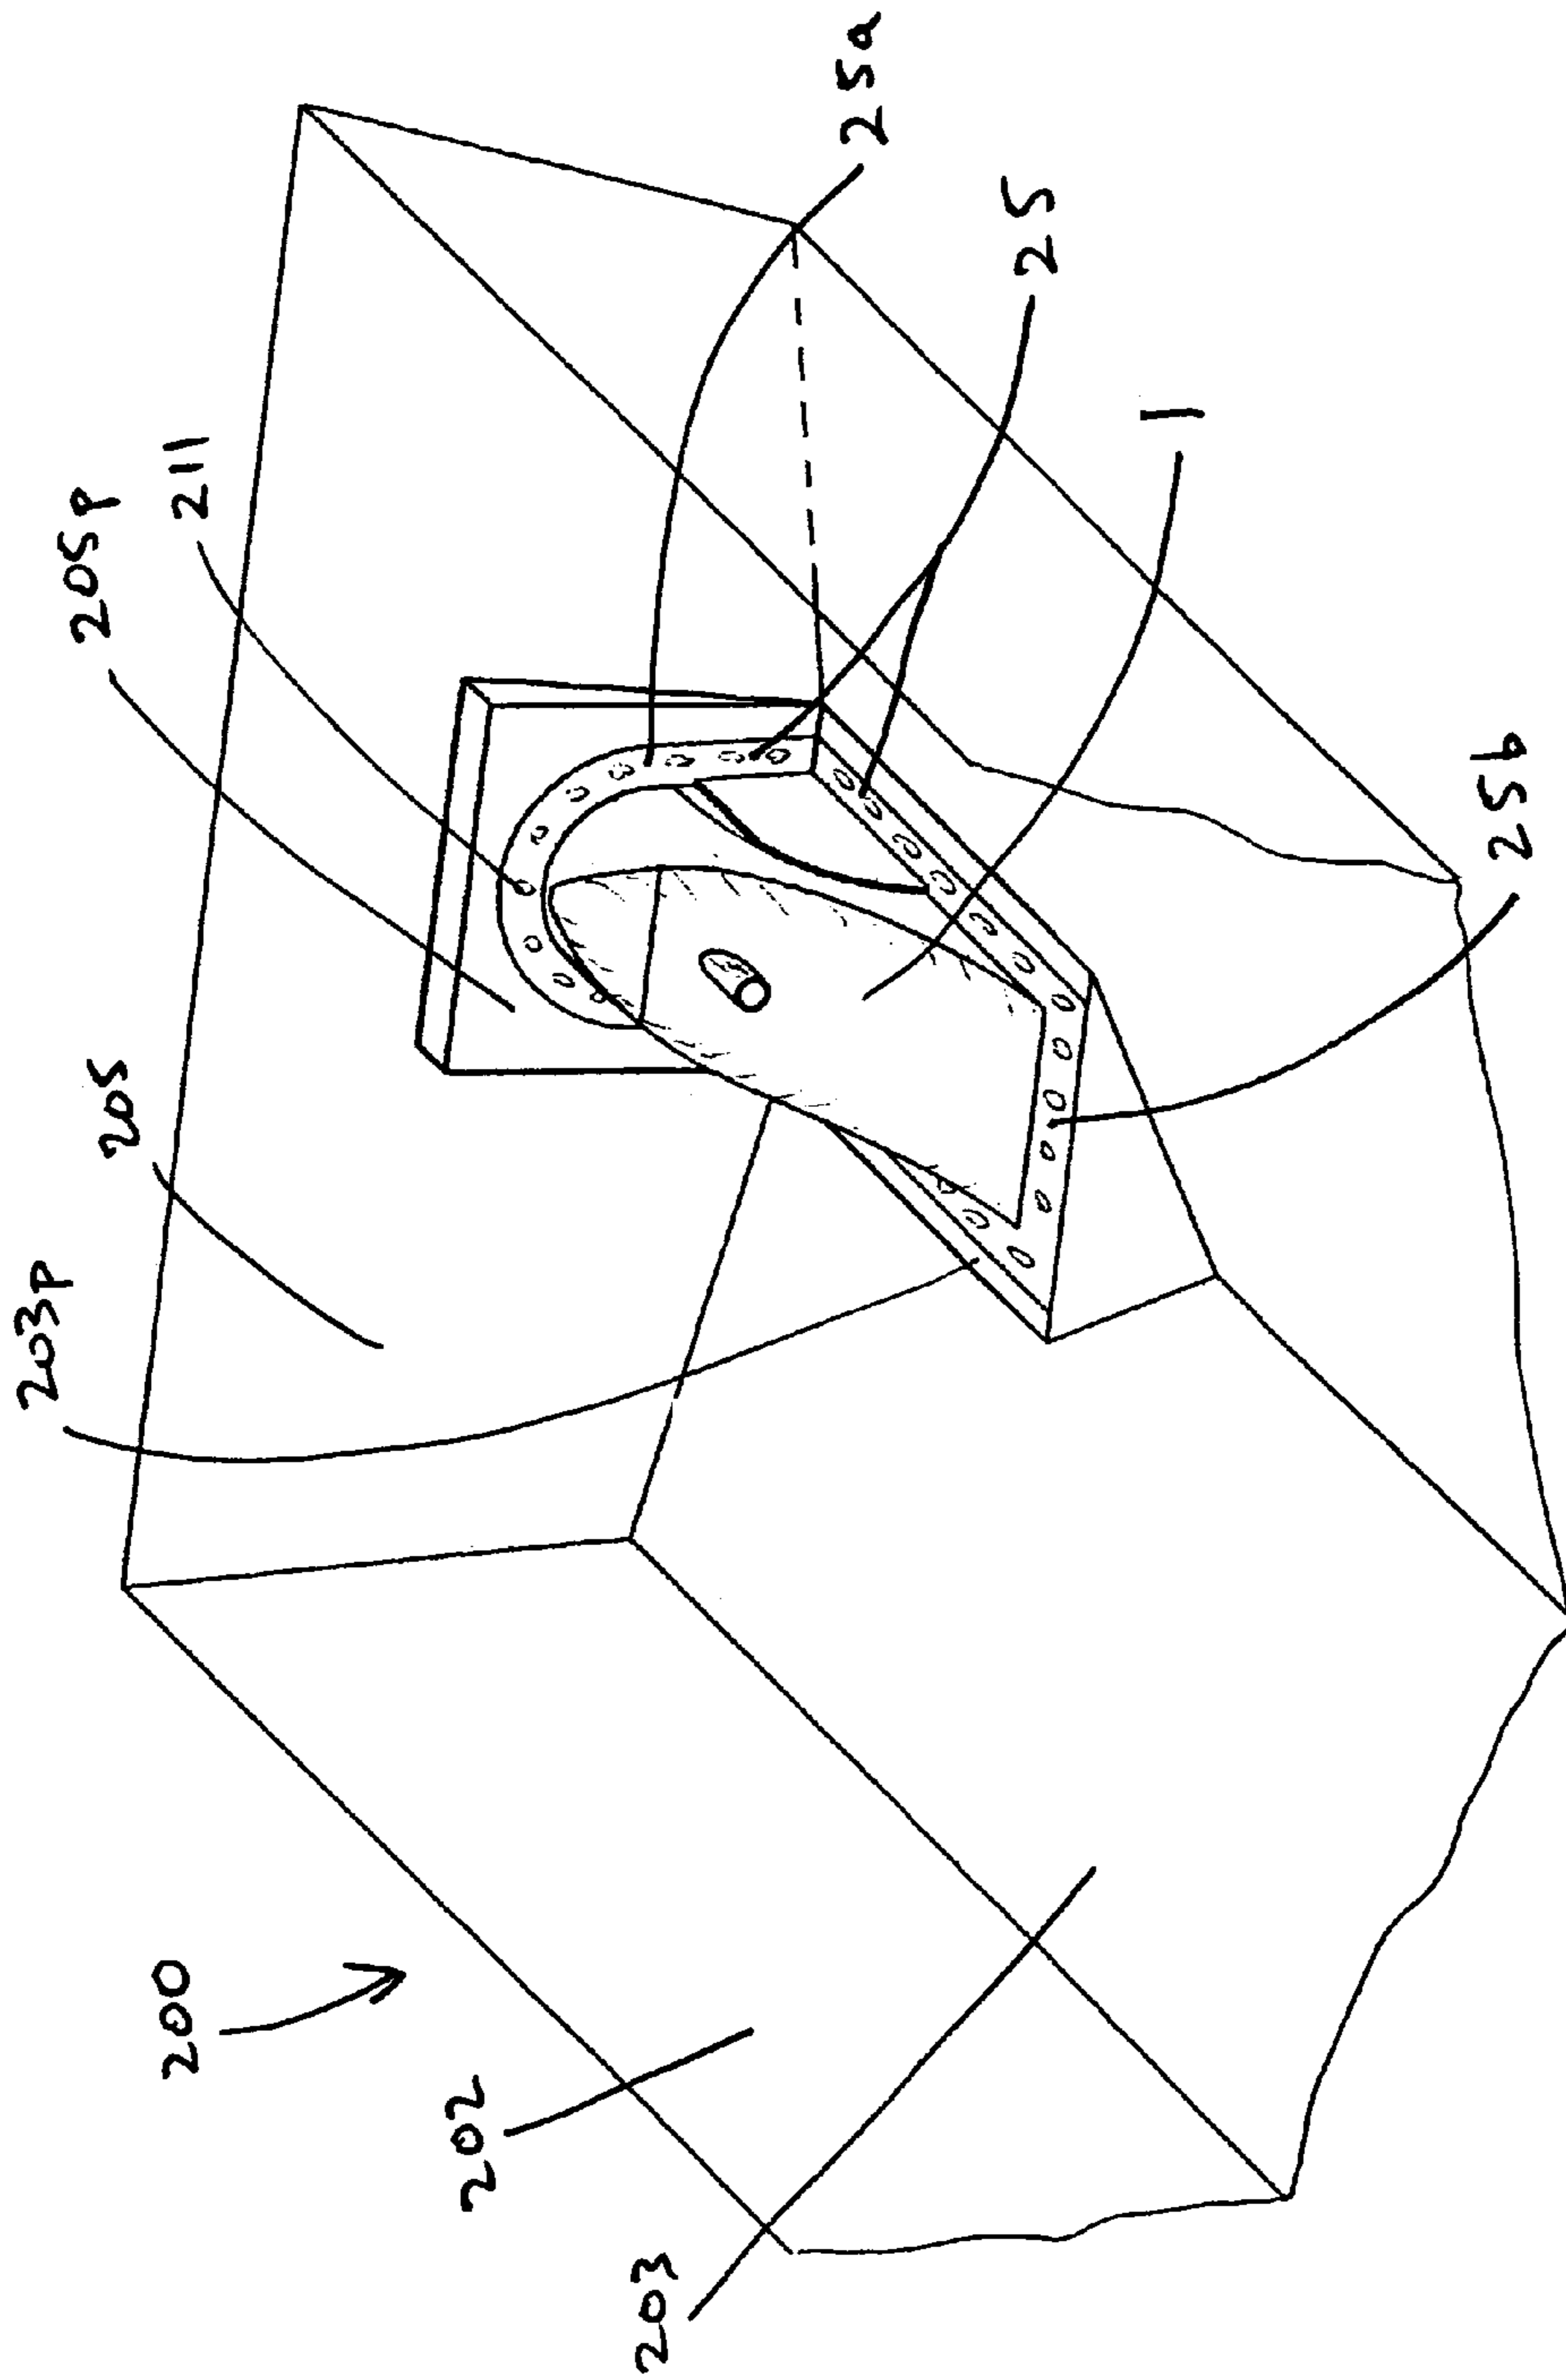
B INTAKE DUCT INSTALLED OVER COMMON OPENING
